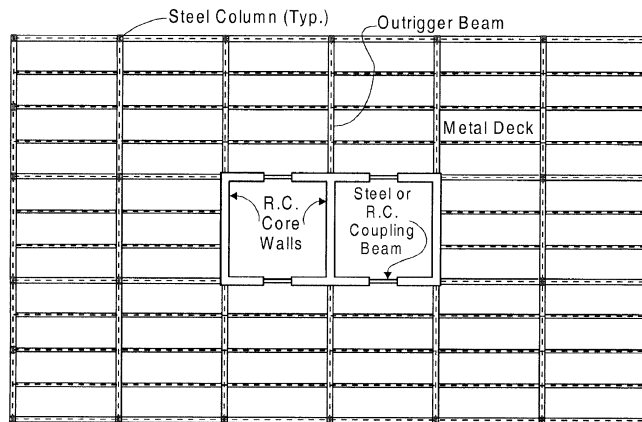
Typical floor plan of a steel frame-reinforced concrete core wall hybrid system
